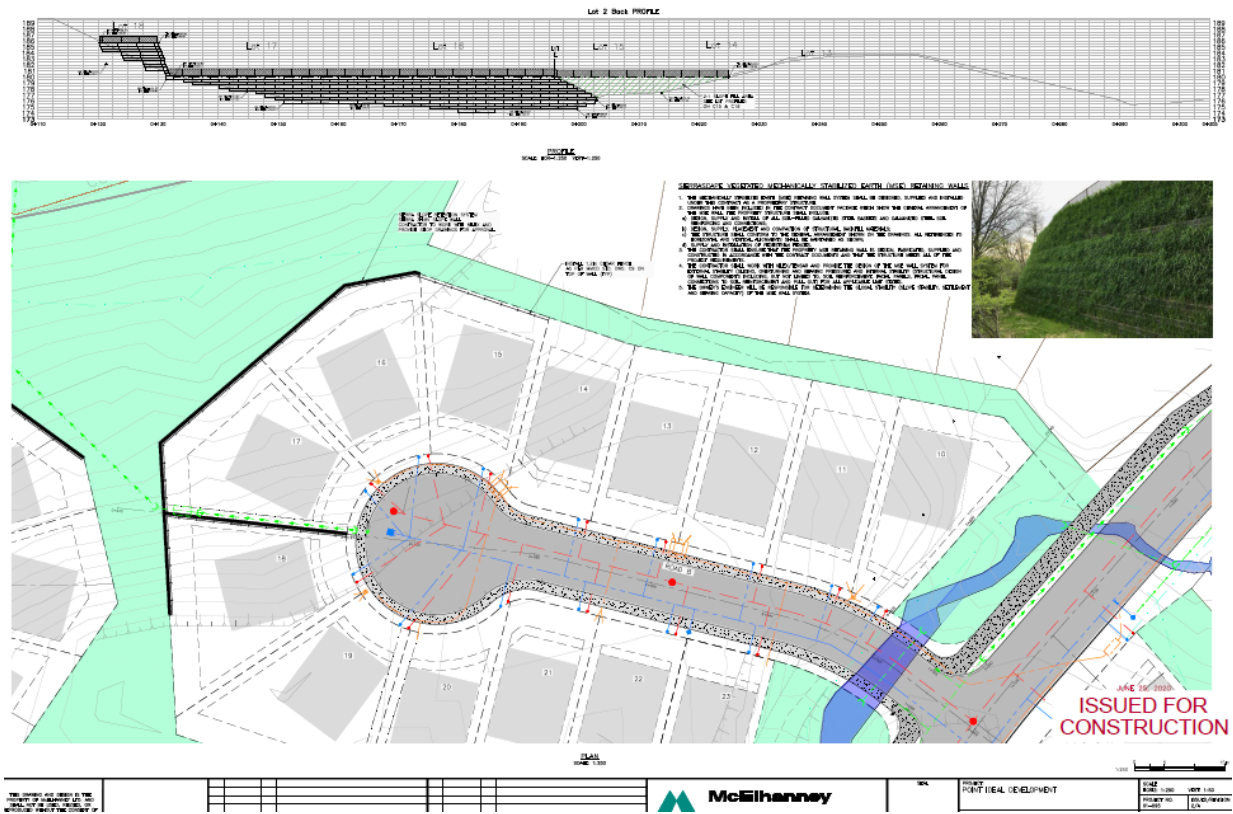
Retaining Wall Profile and Plan for Lots 15-18
